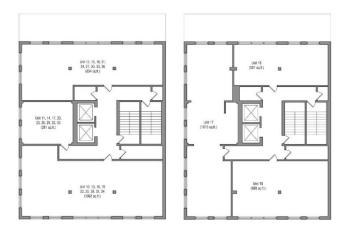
, 239 (left to right, top down): Building 8, sixth floor (1926); same floor (1981). 1'' = 32'. North is to the left.
